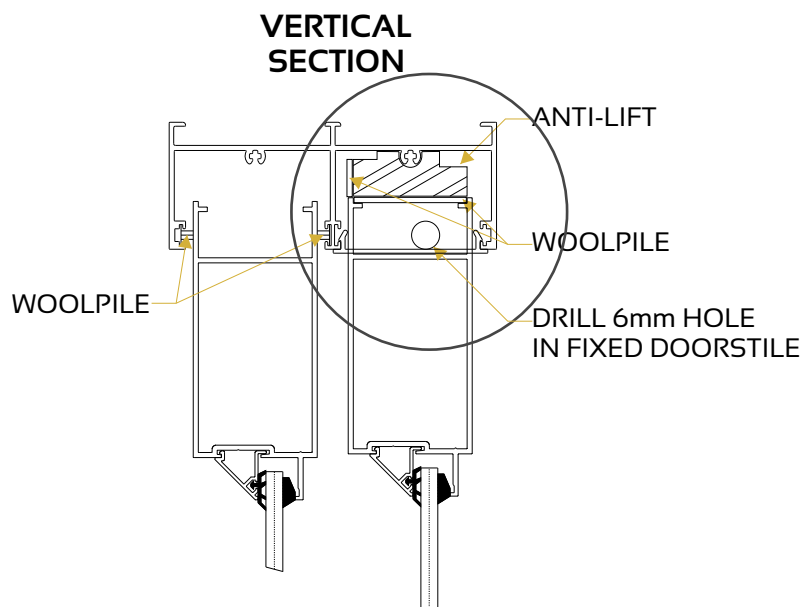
DETAIL TYPICAL TO HEAD AND SILL OF FIXED AND SLIDING LIGHTS
